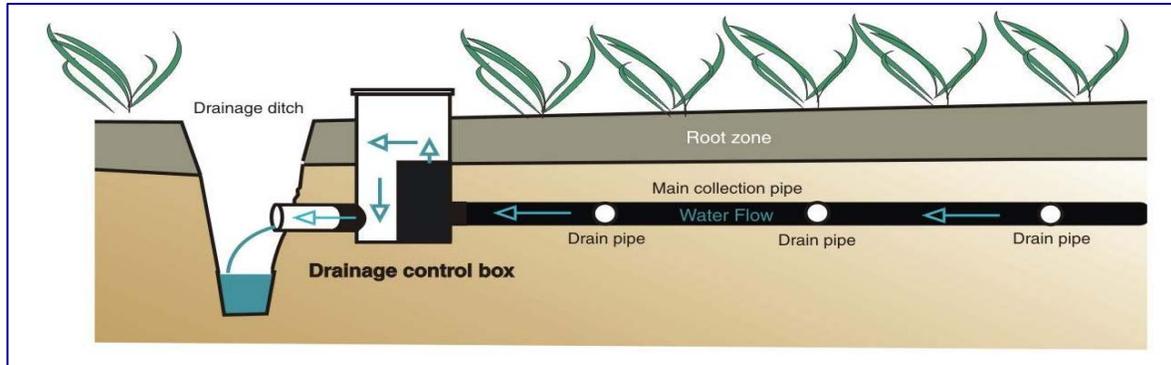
Conceptual Drainage Outlet Control Structure in Subsurface Drain Main
